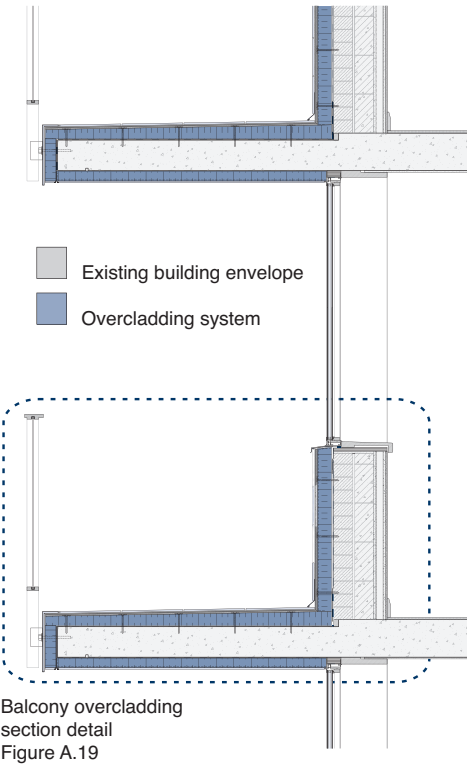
Section and plan views of a balcony overcladding assembly with corresponding detail drawings denoted.
